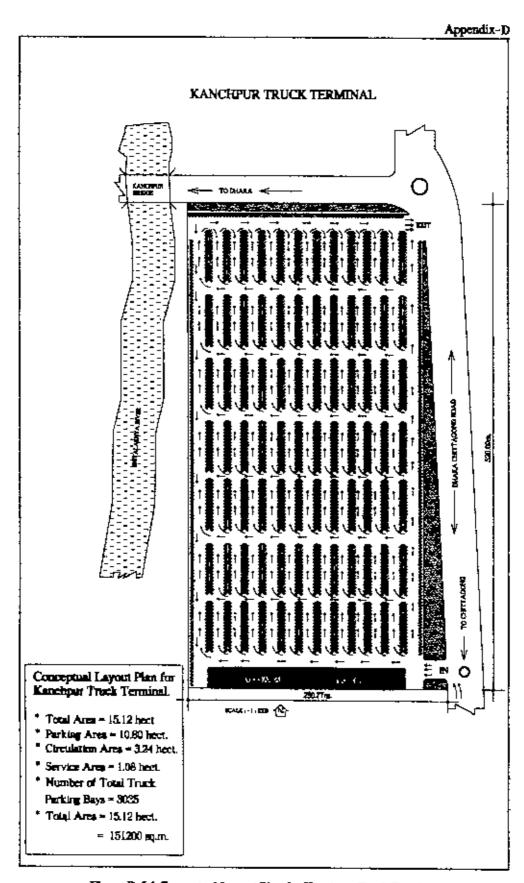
Conceptual Layout Plan for Kanchpur Truck Terminal
